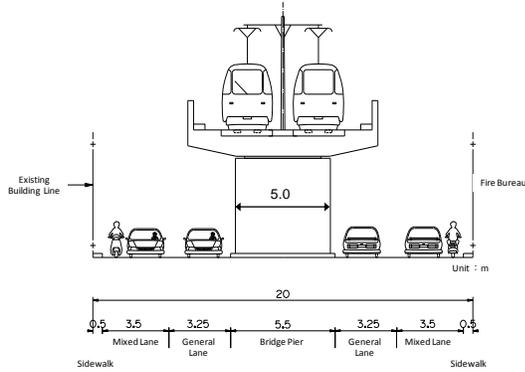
The Column of Single Span Bridge(Size=5.5m)(Original)
